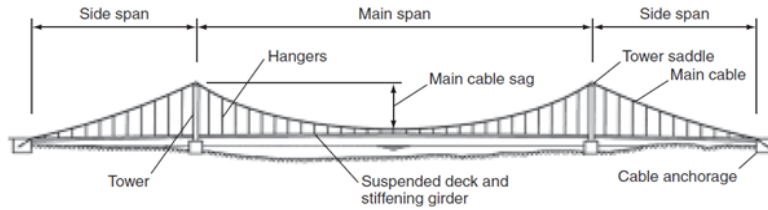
Suspension Bridge Elements. (Barker & Pucket, 2007)
